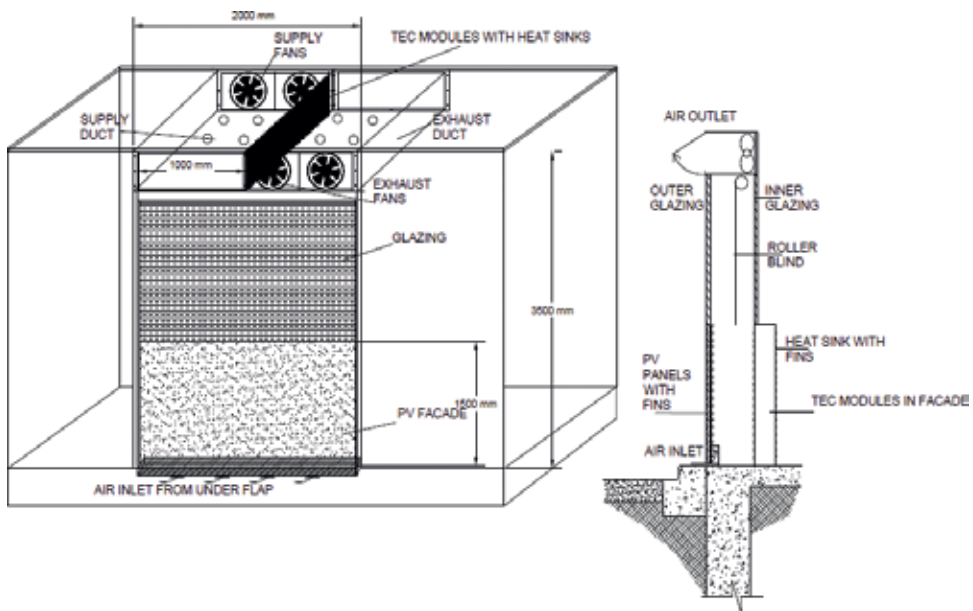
Schematic of a building room zone with TEC modules and PV ventilated façade.
